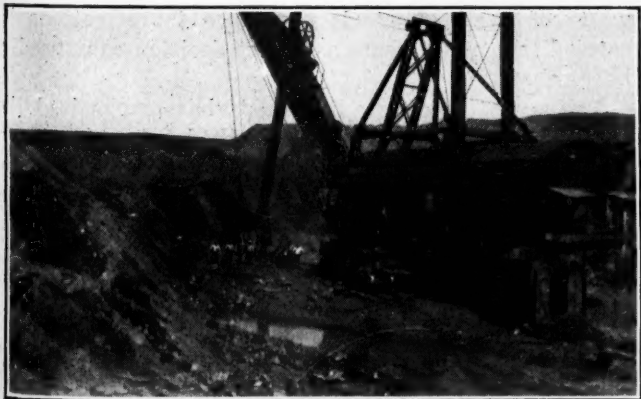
SHOVEL IN CUT ABOUT COMPLETED
